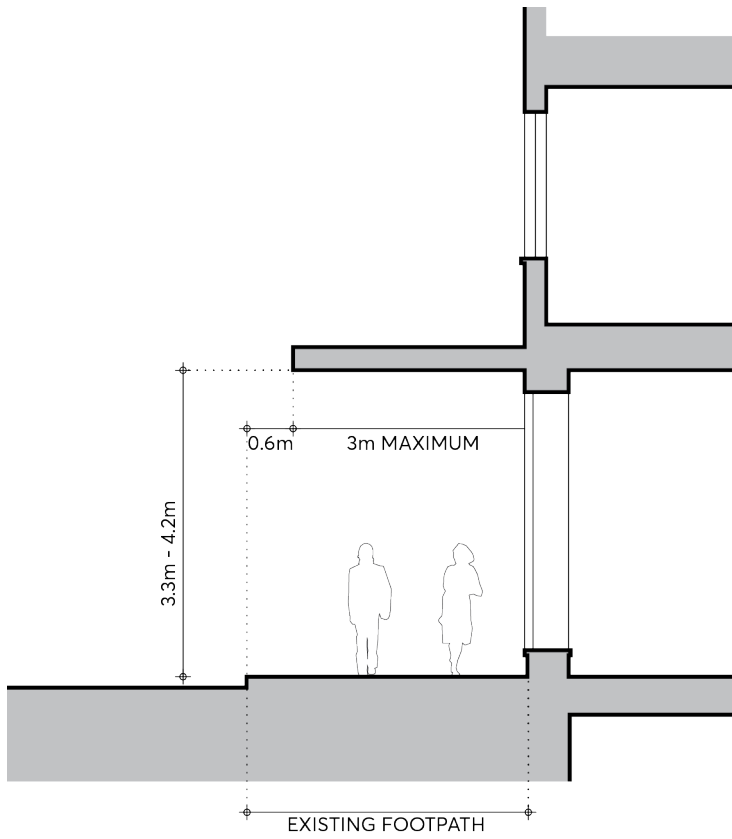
Detailed Section through Macquarie Street
